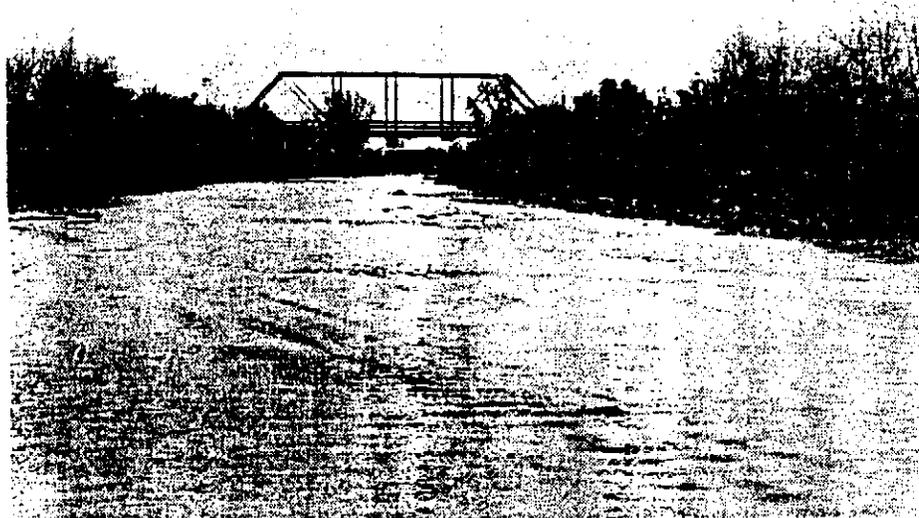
View looking upstream at Congress Street in 1902. The deep arroyo that eroded in 1890 and 1891 made river crossings more difficult. By 1902, a Pratt Truss steel bridge had been erected to span the river at Congress Street. This photograph shows a young stand of willows and cottonwoods that were probably established after the 1890 flood (Arizona Historical Society, Tucson, Negative No. 26698).
